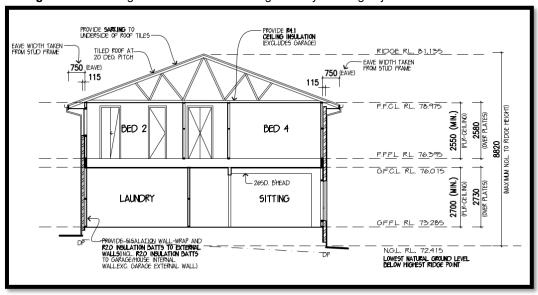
Sectional plan detailing proposed floor level (RL73.285) and adjoining NGL (RL72.415).
